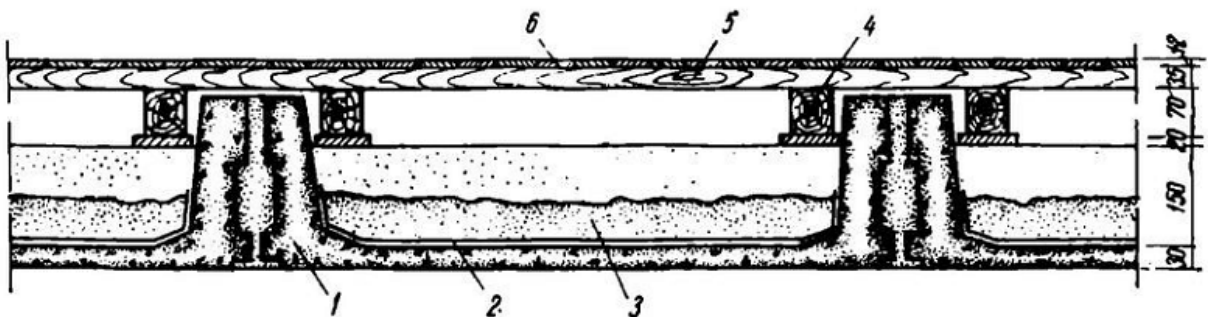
Structure of the floor. 1 – ribbed reinforced concrete slab; 2 – tar paper; 3 – slag layer; 4 – wooden logs; 5 - boards; 6 – parquet [3]
